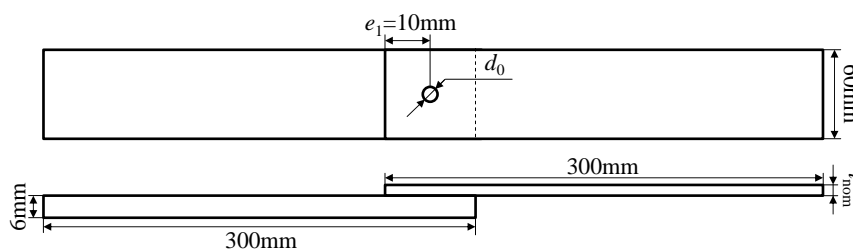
Specimen for shear tests on connections with bolts and blind rivets
